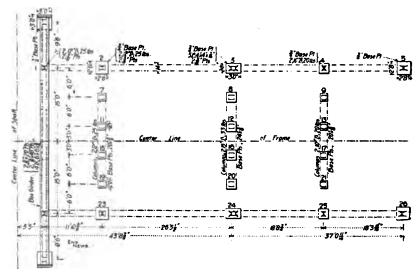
FOUNDATION PLAN FOR SHAFT HOUSE, SIBLEY MINE.
